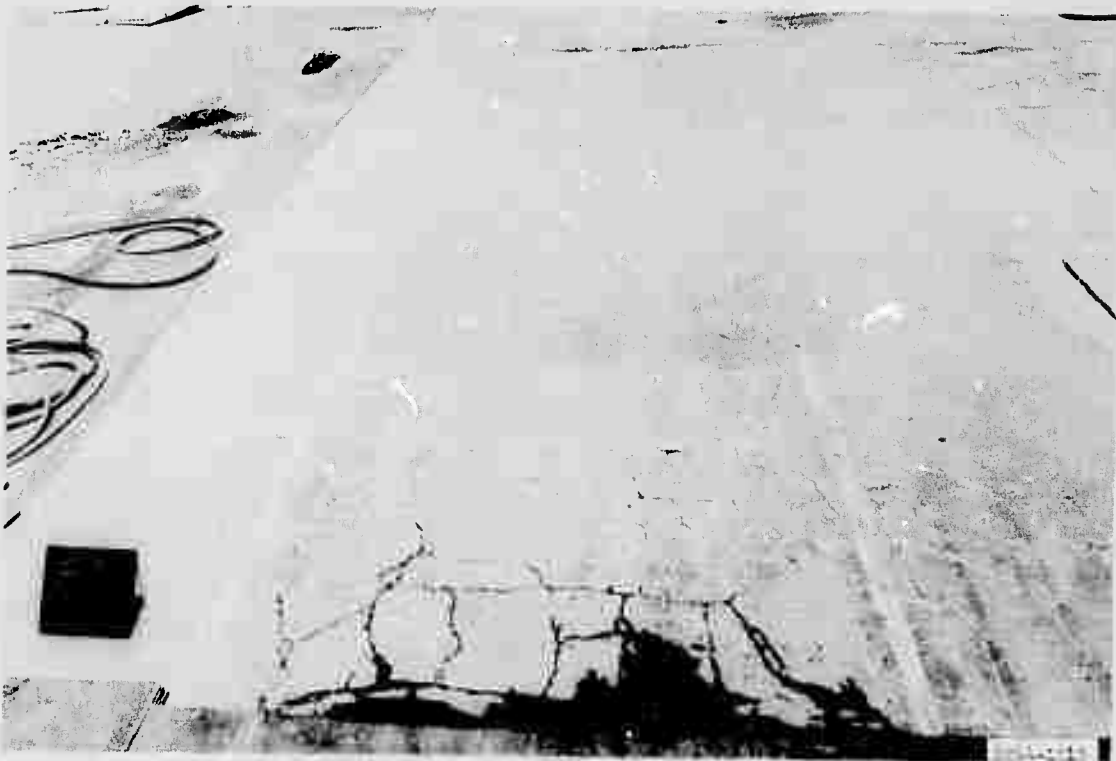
Item 1, lane 2, rigid pavement test section, after 1010 coverages by 240-kip twin-tandem assembly
